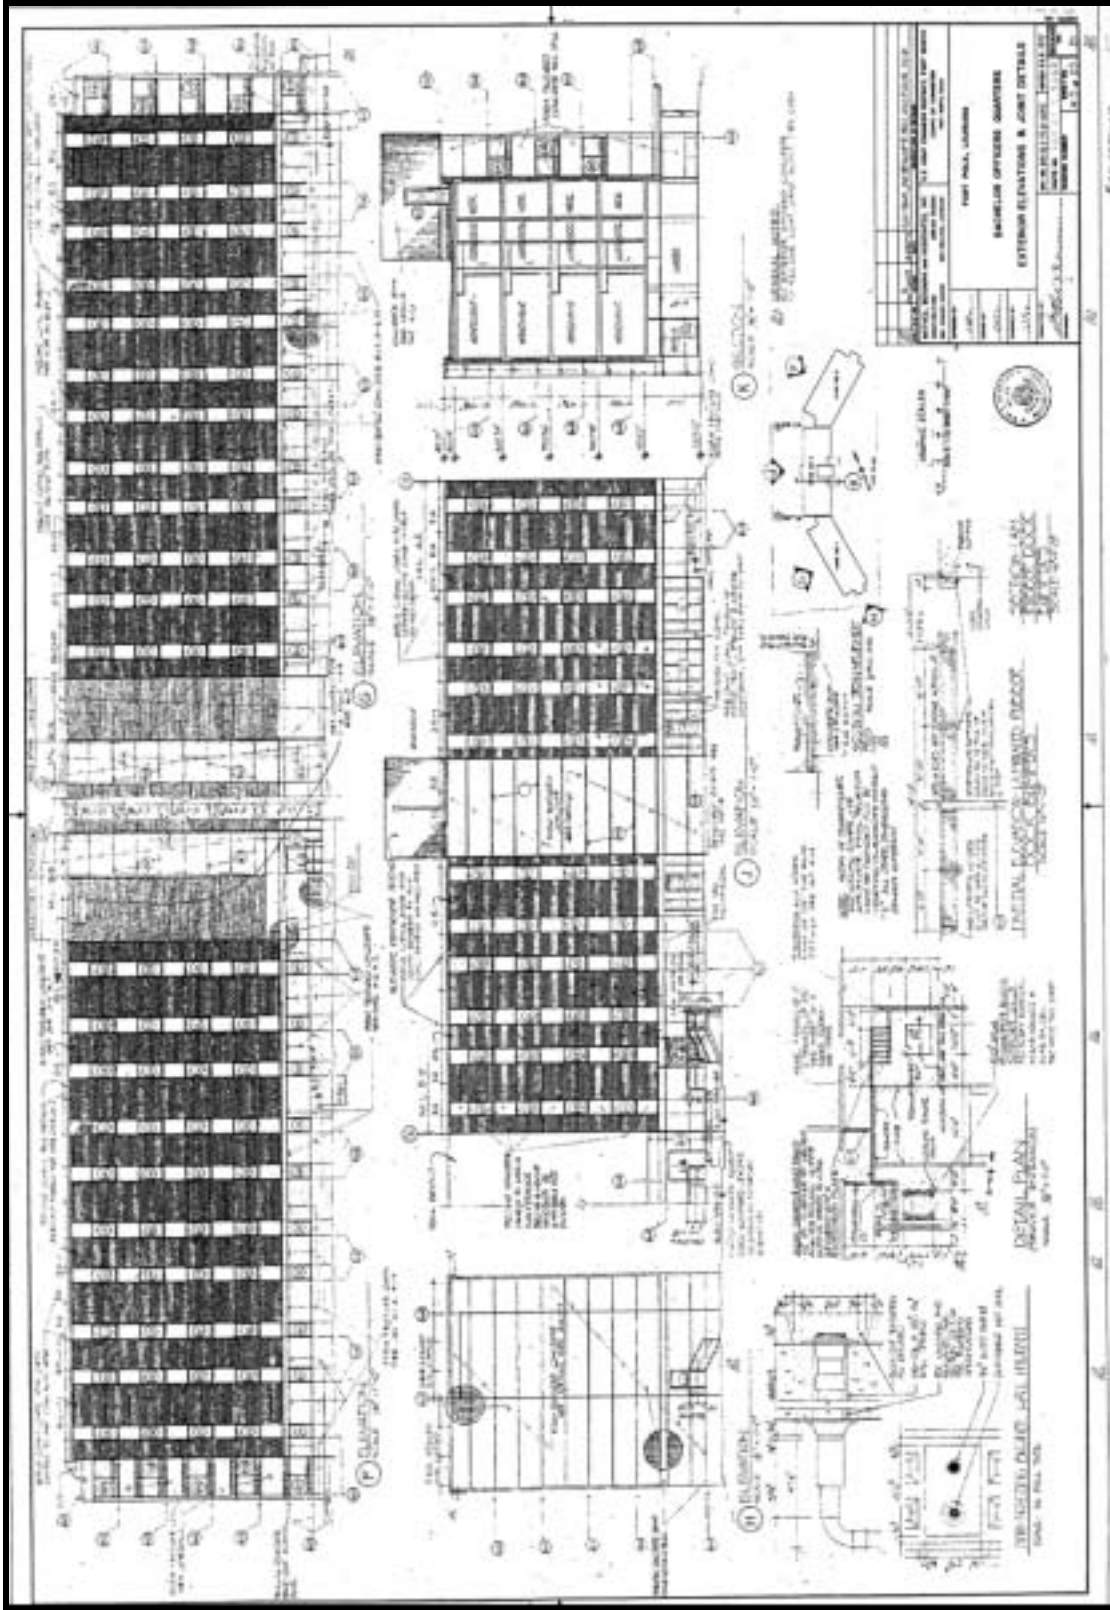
High Rise BOQ, Woodfill Hall, elevations, Ft. Polk (1977, revised 1977) (Engineering, Ft. Polk).
